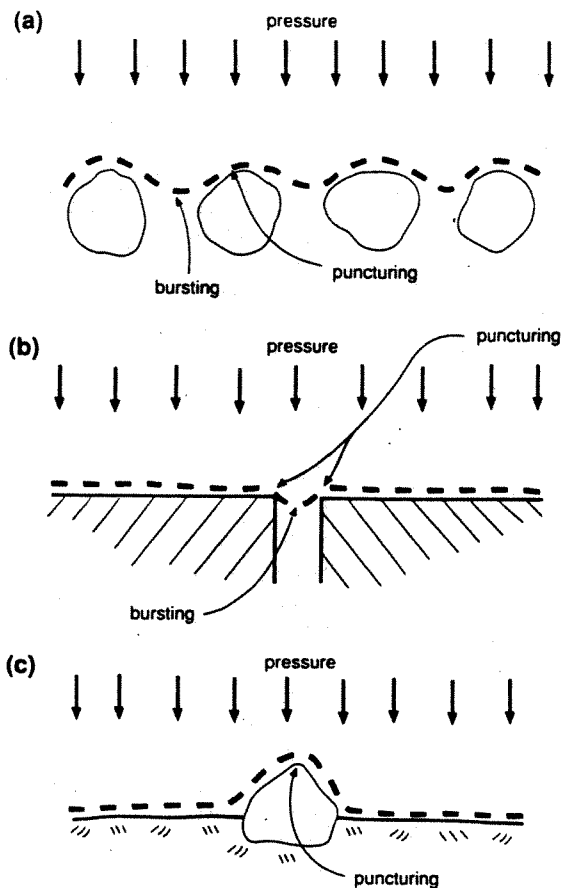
Typical situations of a geotextile separator between fine soil and (a) stone bed; (b) solid material such as concrete, rock or boards with cracks or gaps; (c) isolated stones.
